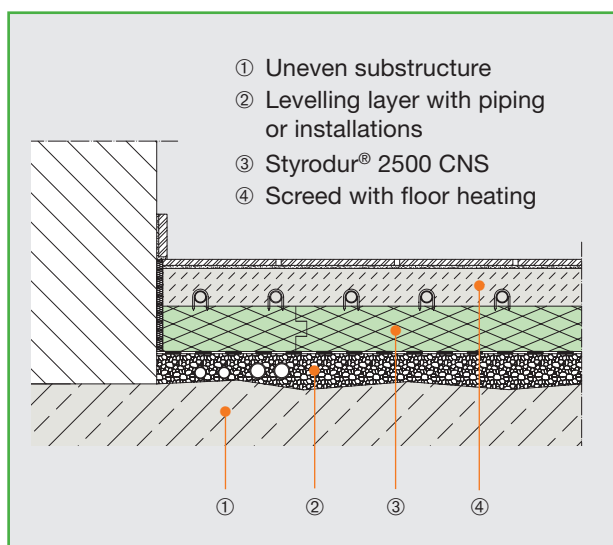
Floor structure with Styrodur 2500 CNS and a levelling layer.
